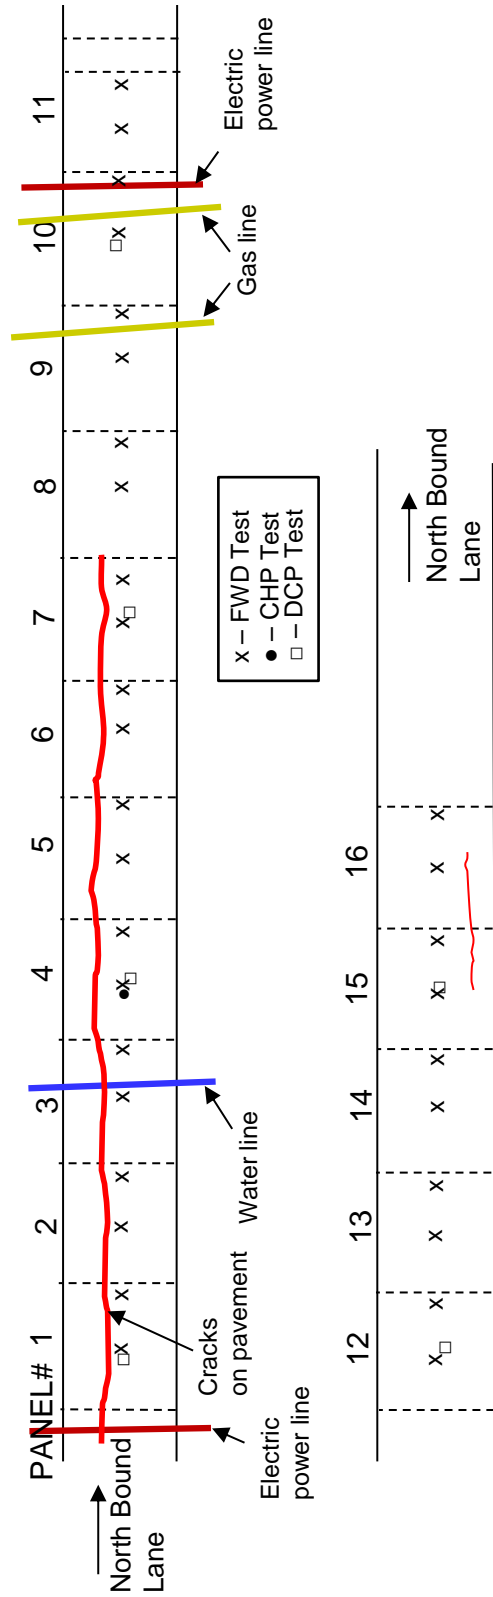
Crack Survey Map — Cliff Road (Site B), Burlington
